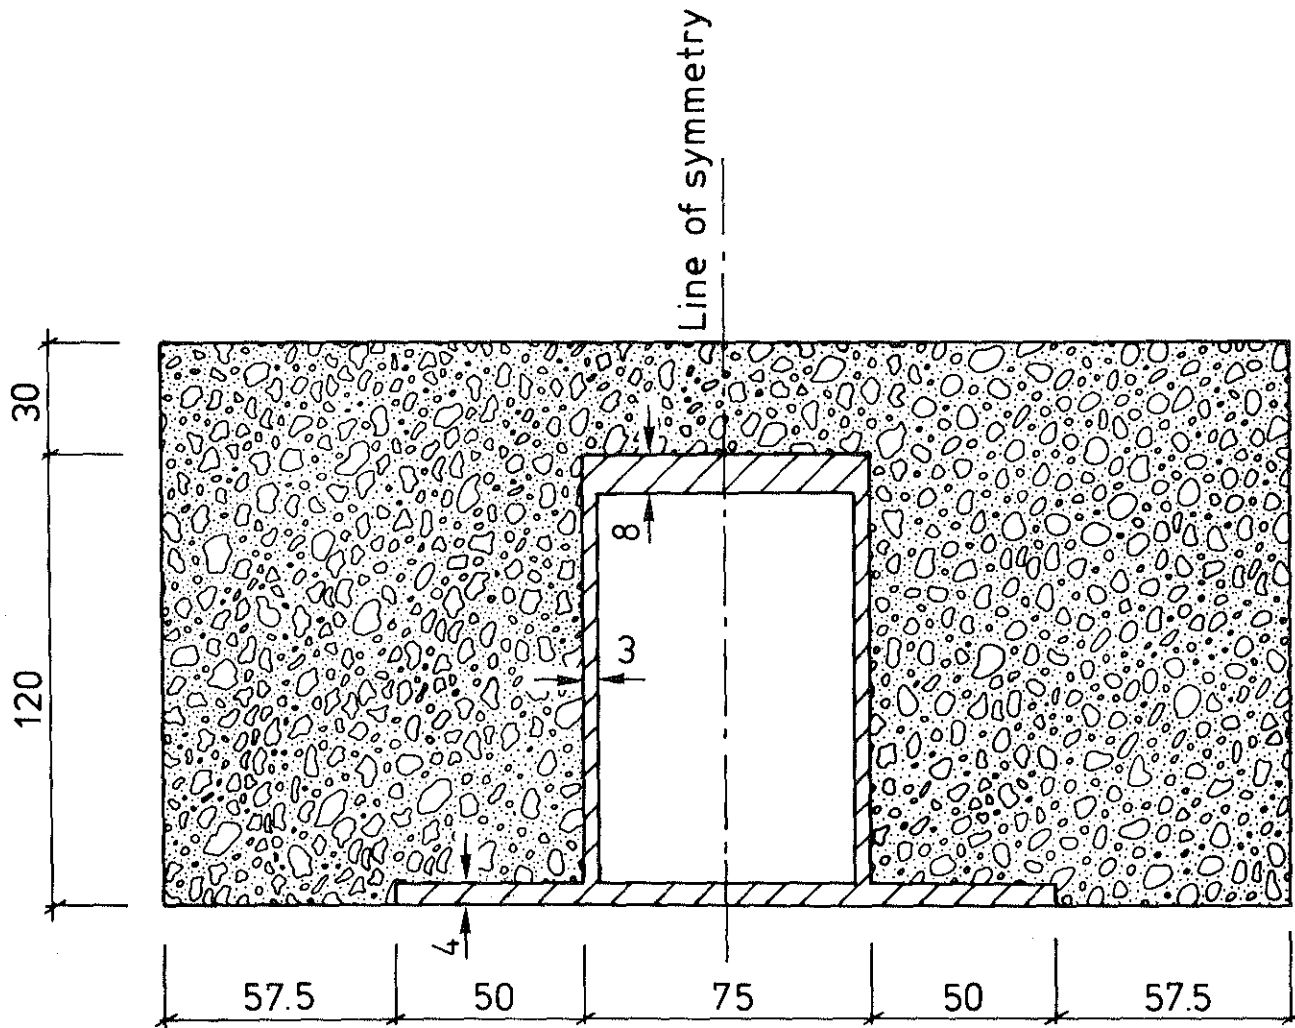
Box girder embedded in a concrete slab. The vertical concrete sides were insulated during furnace test. Dimensions in mm
